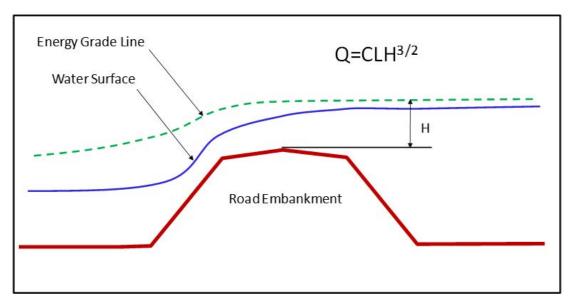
Illustration of flow overtopping a roadway embankment.
